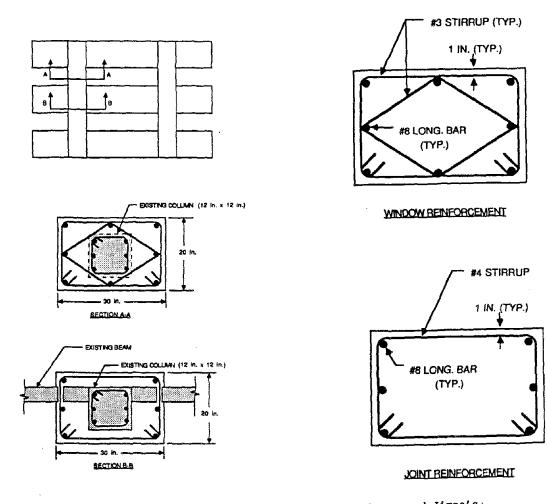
Reinforcement details of Stoppenhagen and Jirsa's: encased columns [2.19].
